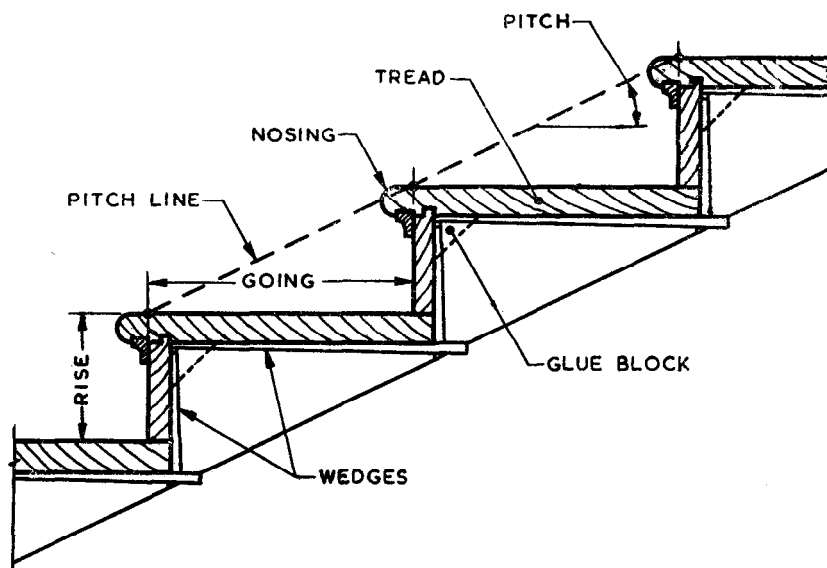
DETAILS OF TREAD AND RISER SHOWING ALSO THEIR FITTINGS INTO A CLOSE STRING
